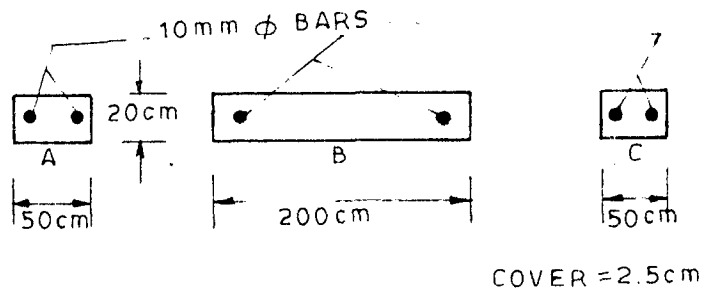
\_ REINFORCEMENT IN PIERS
